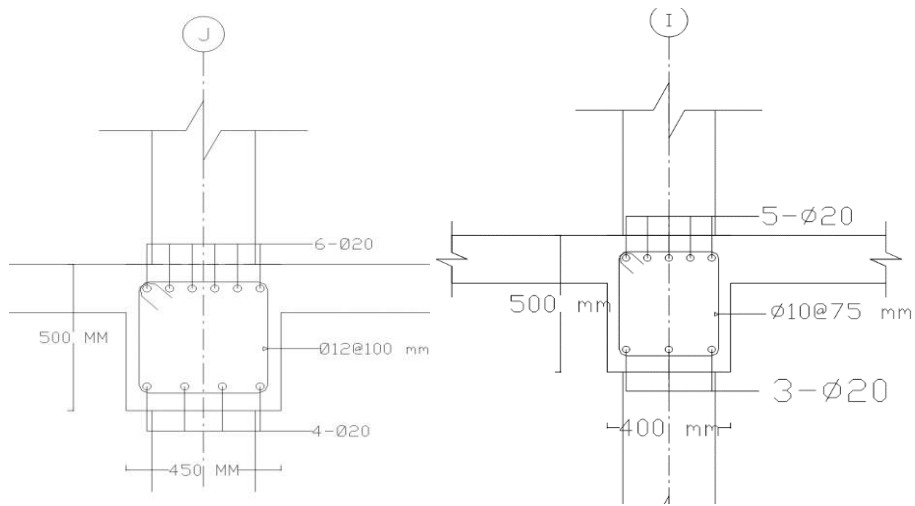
Show Steel Reinforcement Details for Span 6.3 m Beams Model (6.3-5.5-5.2).
